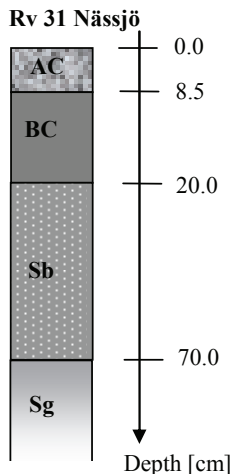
Cross section of the pavement structure at Rv31 Nässjö. AC = asphalt concrete, BC = Base course, Sb = subbase and Sg = subgrade
